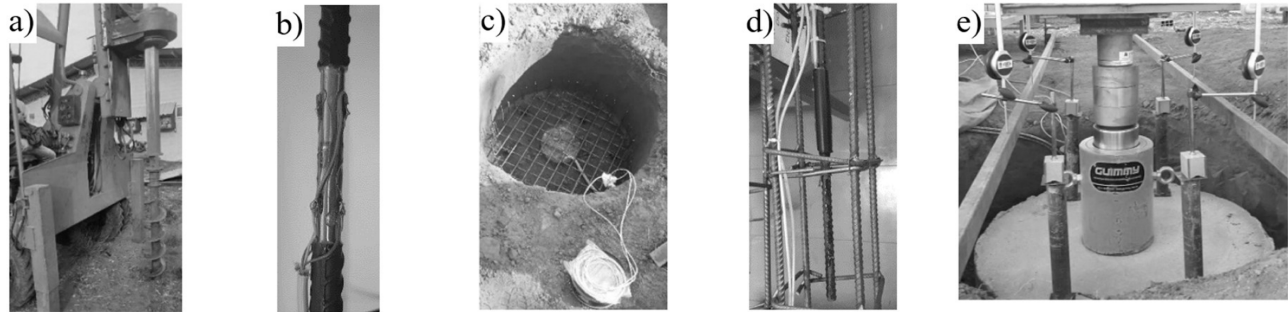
Research stages: a) pile drilling; b) instrumented bar with strain gauges; c) positioning of the bar in the pile reinforcement cage; d) excavation and construction of the footing or raft; e) static load test.
